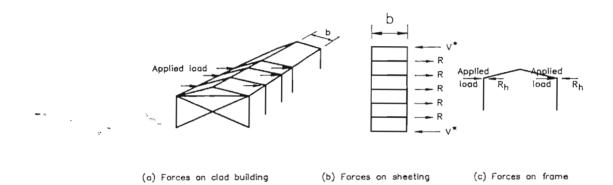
Plastic design of clad pitched roof portal frame under side loads.
